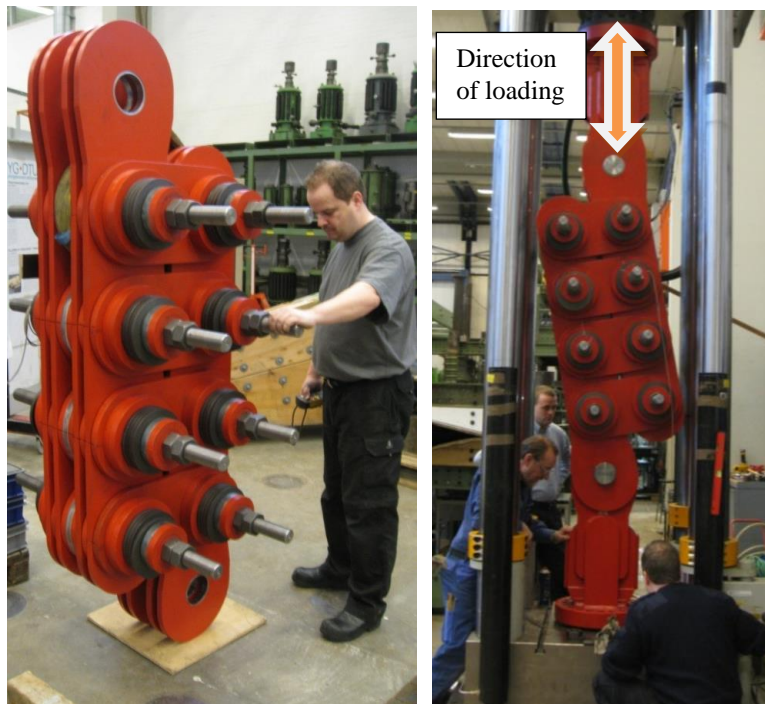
5000 kN Damper Tests in Technical University of Denmark
